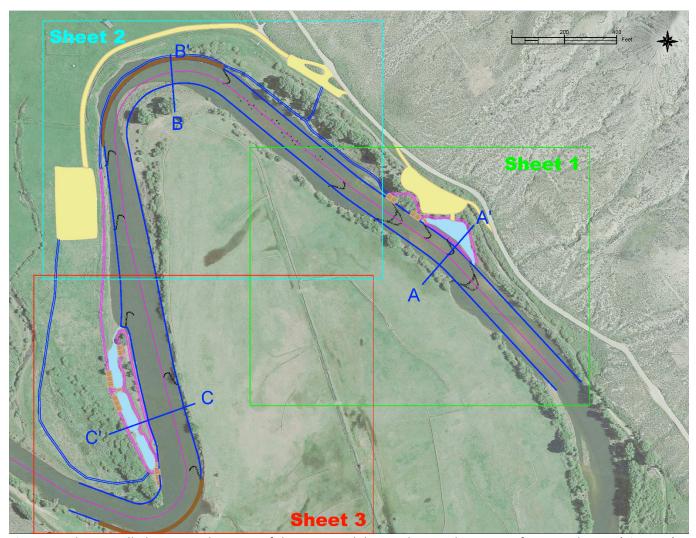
The overall Blue River plan view of the proposed design showing locations of Design Sheet 1 (Figure 4), Design Sheet 2 (Figure 5), Design Sheet 3 (Figure 6), and cross-sections A–A', B–B', and C–C'.
